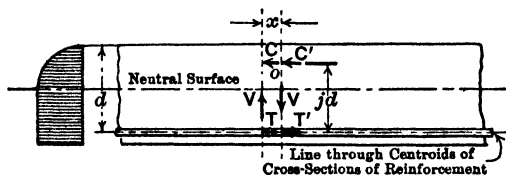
Diagram of Shearing Stresses in a Reinforced-Concrete Beam
